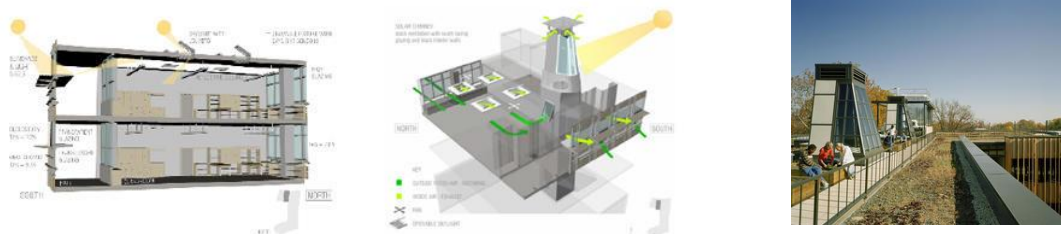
& 15. Diagram showing the light entry, solar chimney and existing rooftop garden. © KieranTimberlake Associates © Barry Halkin
